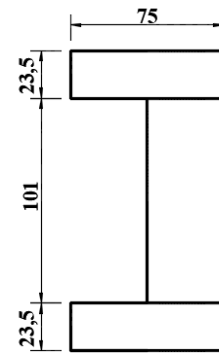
Cross section of the girder HFSPG5 [18] (dimension are in mm)
